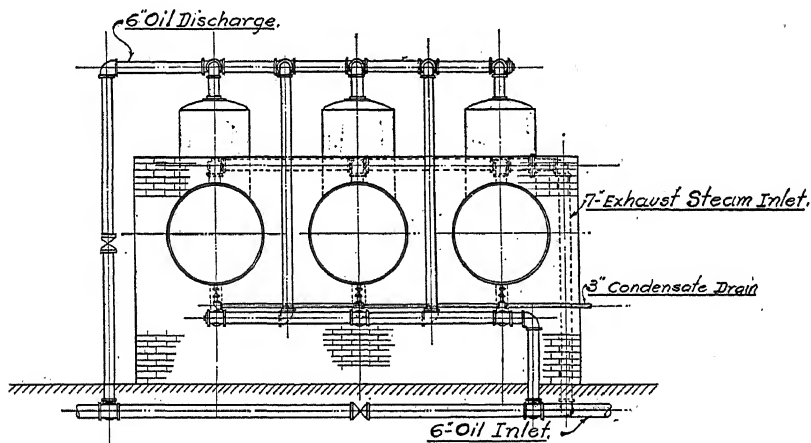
FIRST OIL-HEATING PLANT. END ELEVATION.
